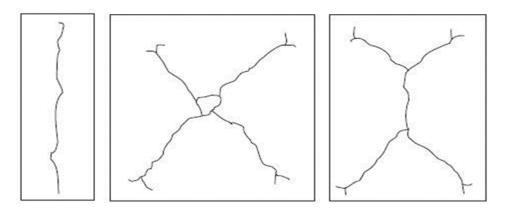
Patterns of Cracks in Reinforced Concrete Slabs Due to Improper Structural Design
